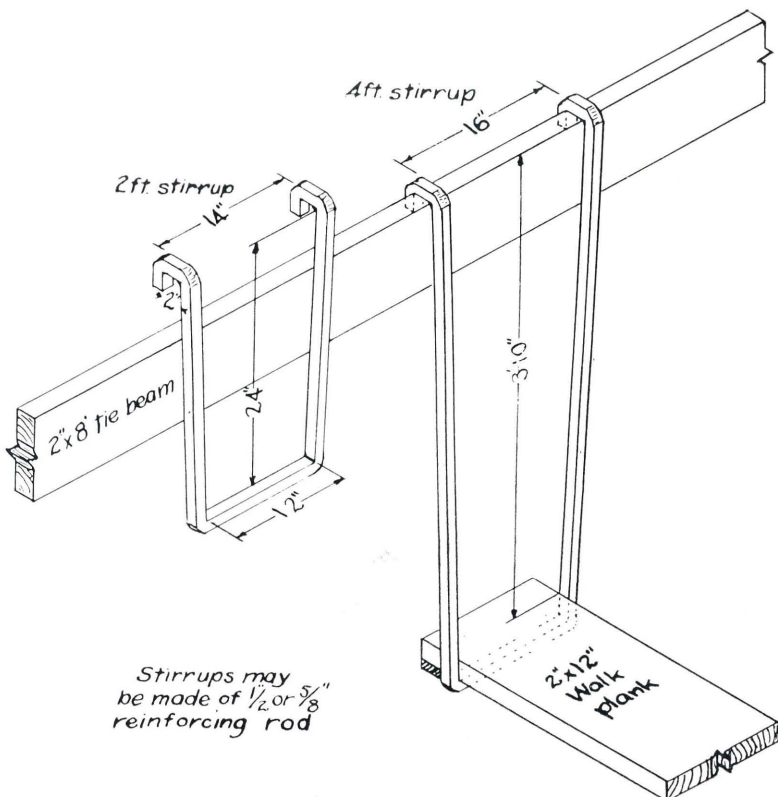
Movable stirrups used for supporting walk planks in filling bins.
